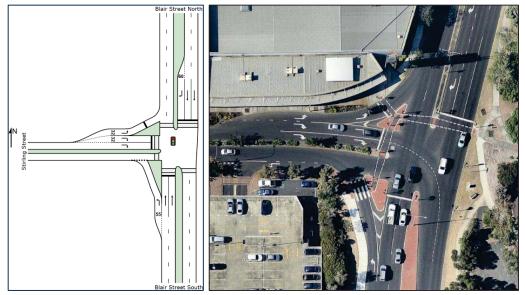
Indicative Layout for the Blair Street/Stirling Street Intersection
